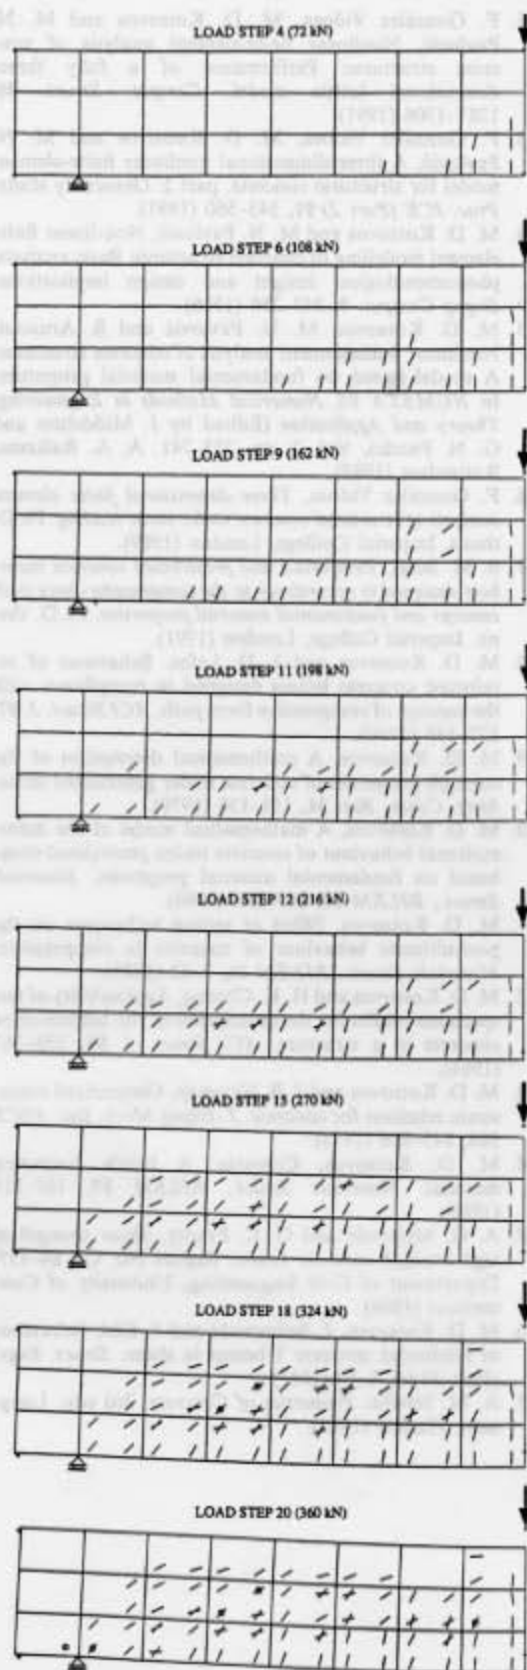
Beam B150-11-3. Crack patterns at various load levels up to failure.
